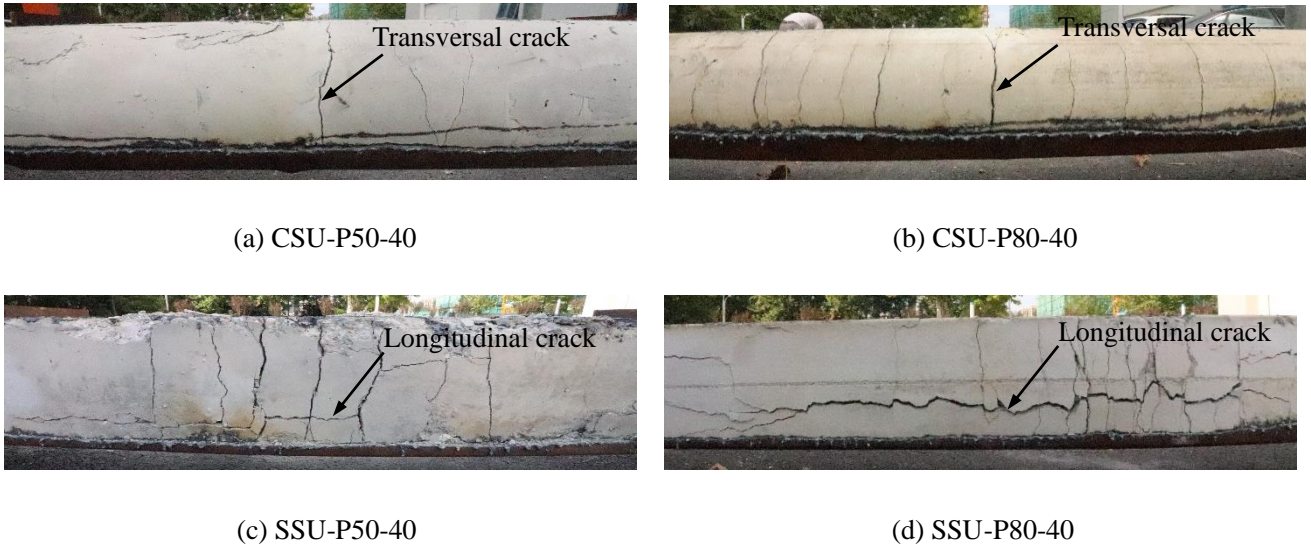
Concrete failure mode of eccentric compression specimens at tension side
